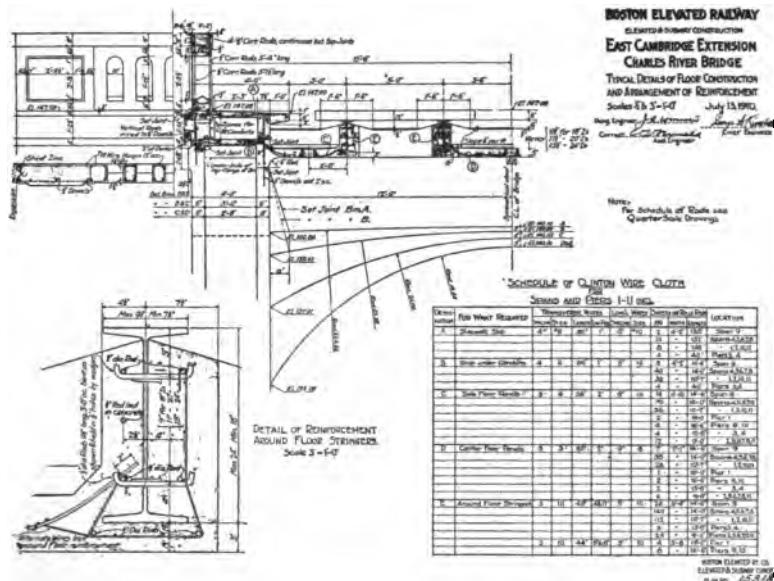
FLOOR REINFORCEMENT AND BALUSTRADE.
